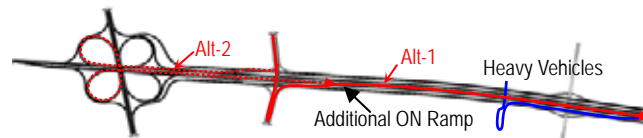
Recommended Modification of the LHLE Connection Plan (Outflow)
